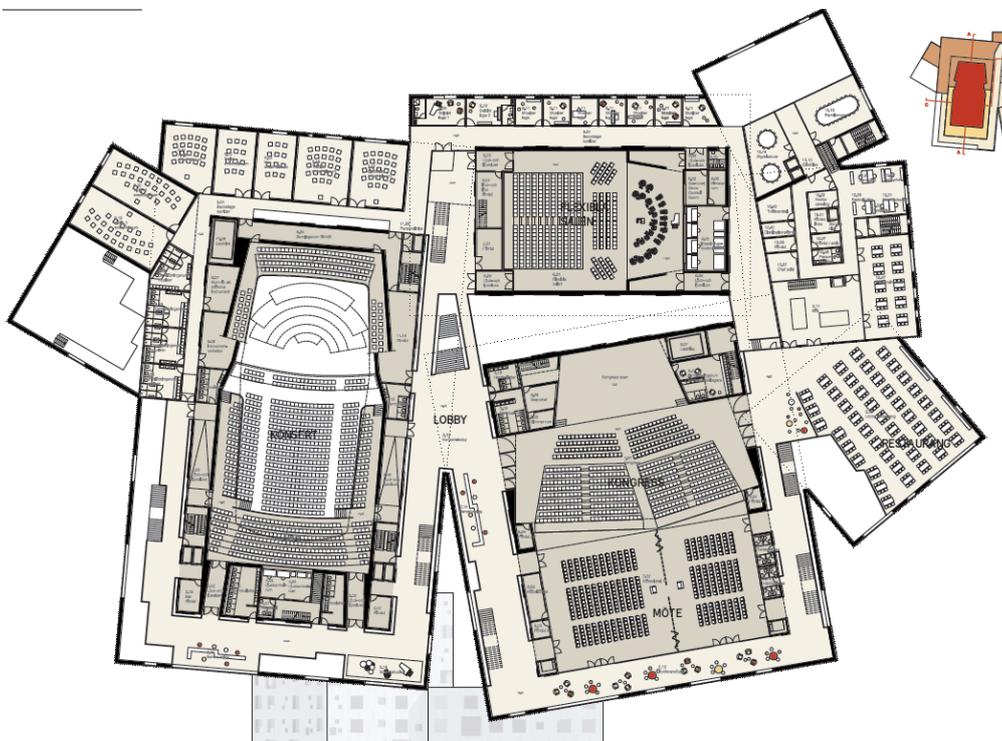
Plan of the new concert hall complex KKH in Malmö, Sweden
